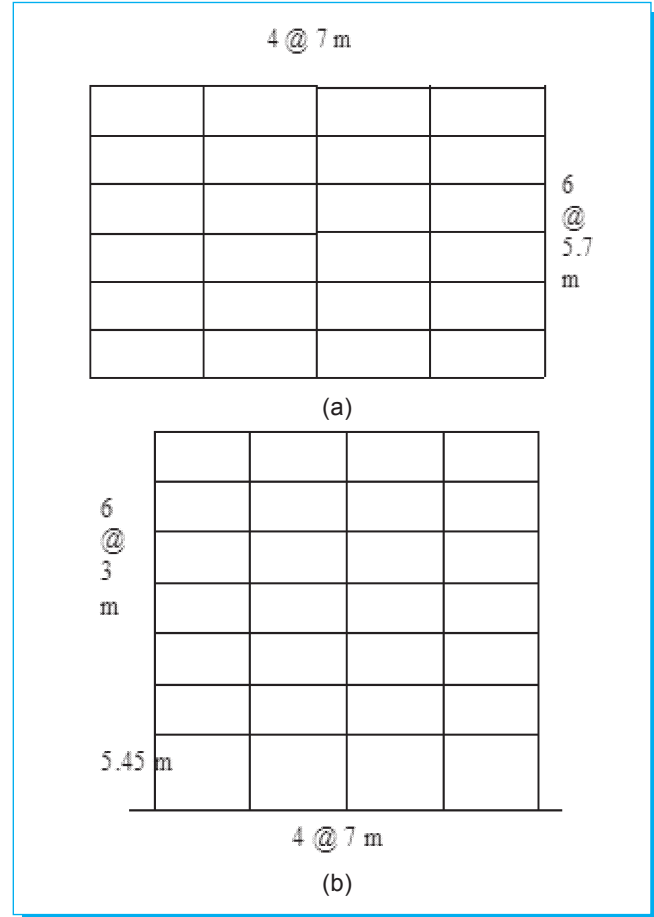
(a) Plan and (b) elevation of a typical reinforced concrete building in Mexico City.
